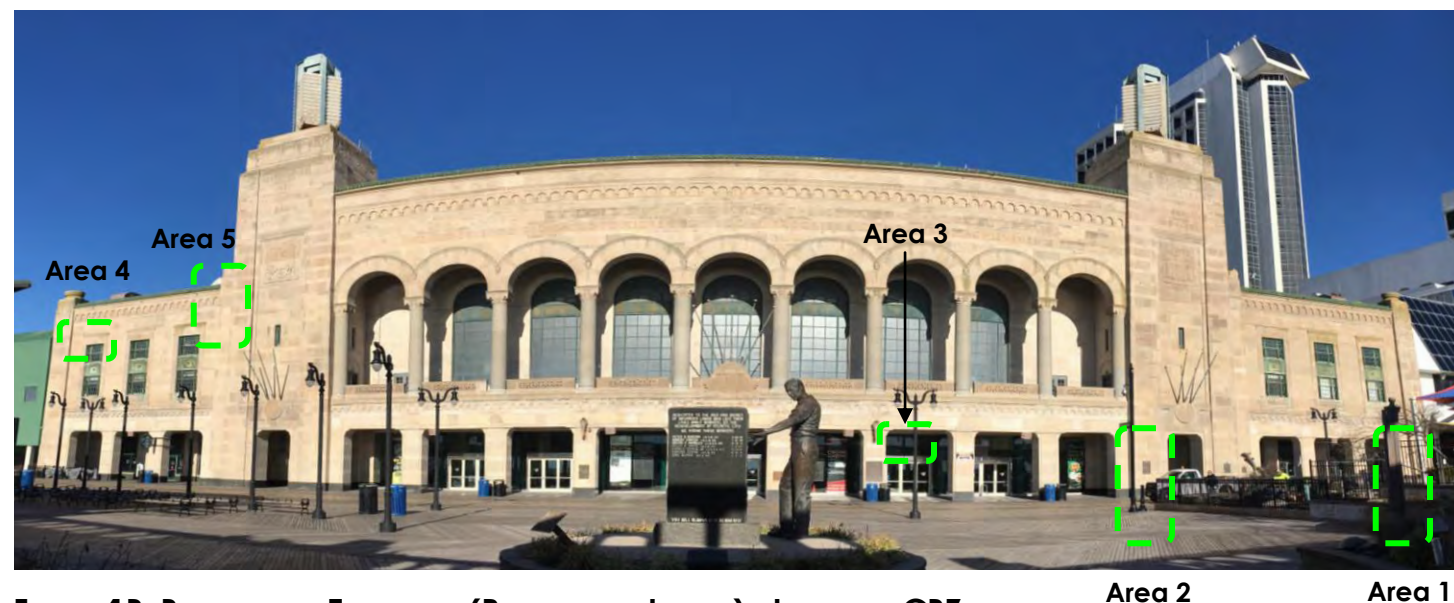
B: BOARDWALK ELEVATION (PANORAMIC IMAGE) - IMAGE BY CBZ
